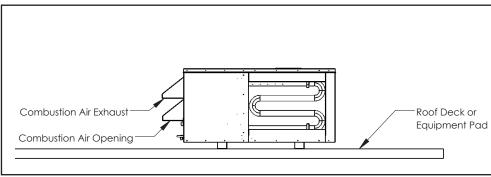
OUTDOOR HORIZONTAL VENTING
